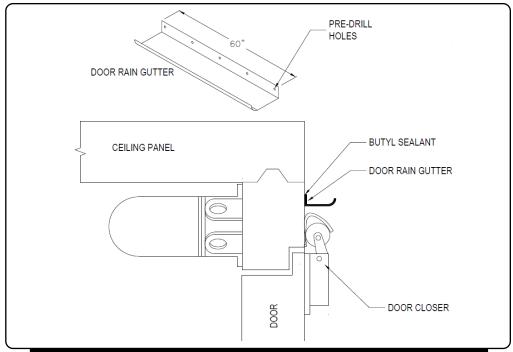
B. DOOR CAP INSTALLATION SIDE VIEW
